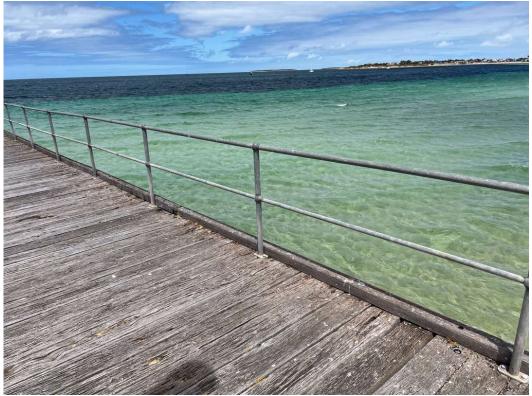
Typical condition '4' of handrail – RHS of the jetty
